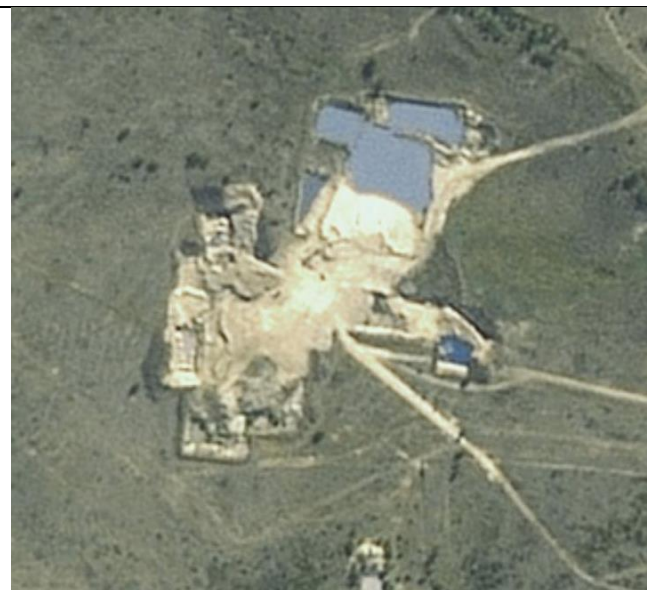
New Laneway 2009 – topsoil stockpiles in west and north
